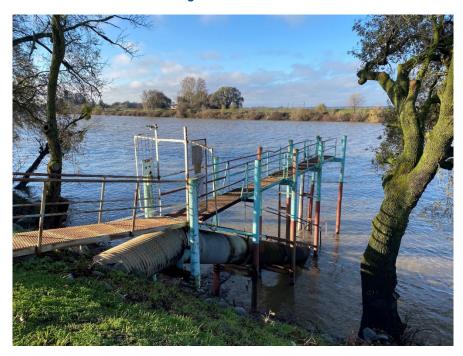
Catwalk, catwalk railing, 36-inch corrugated metal pipe discharge pipe and support piles. Looking northwest from levee crown. December 16, 2021
